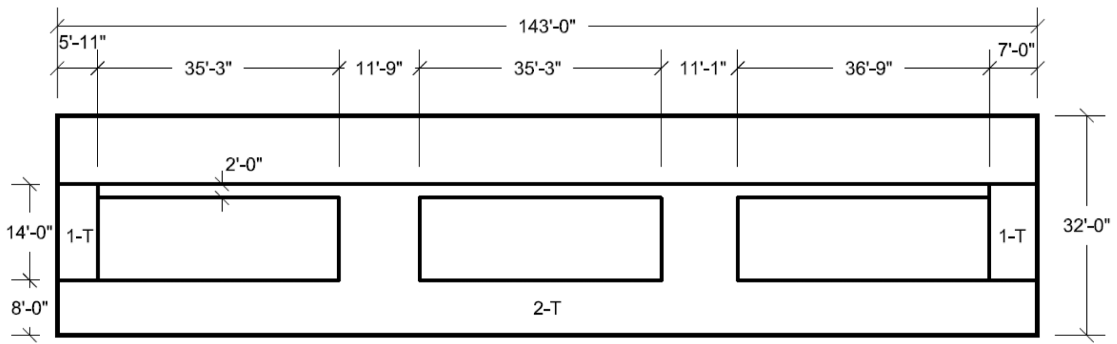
H.6-65 Pump House South Wall Looking South Transverse Reinforcement Zones
